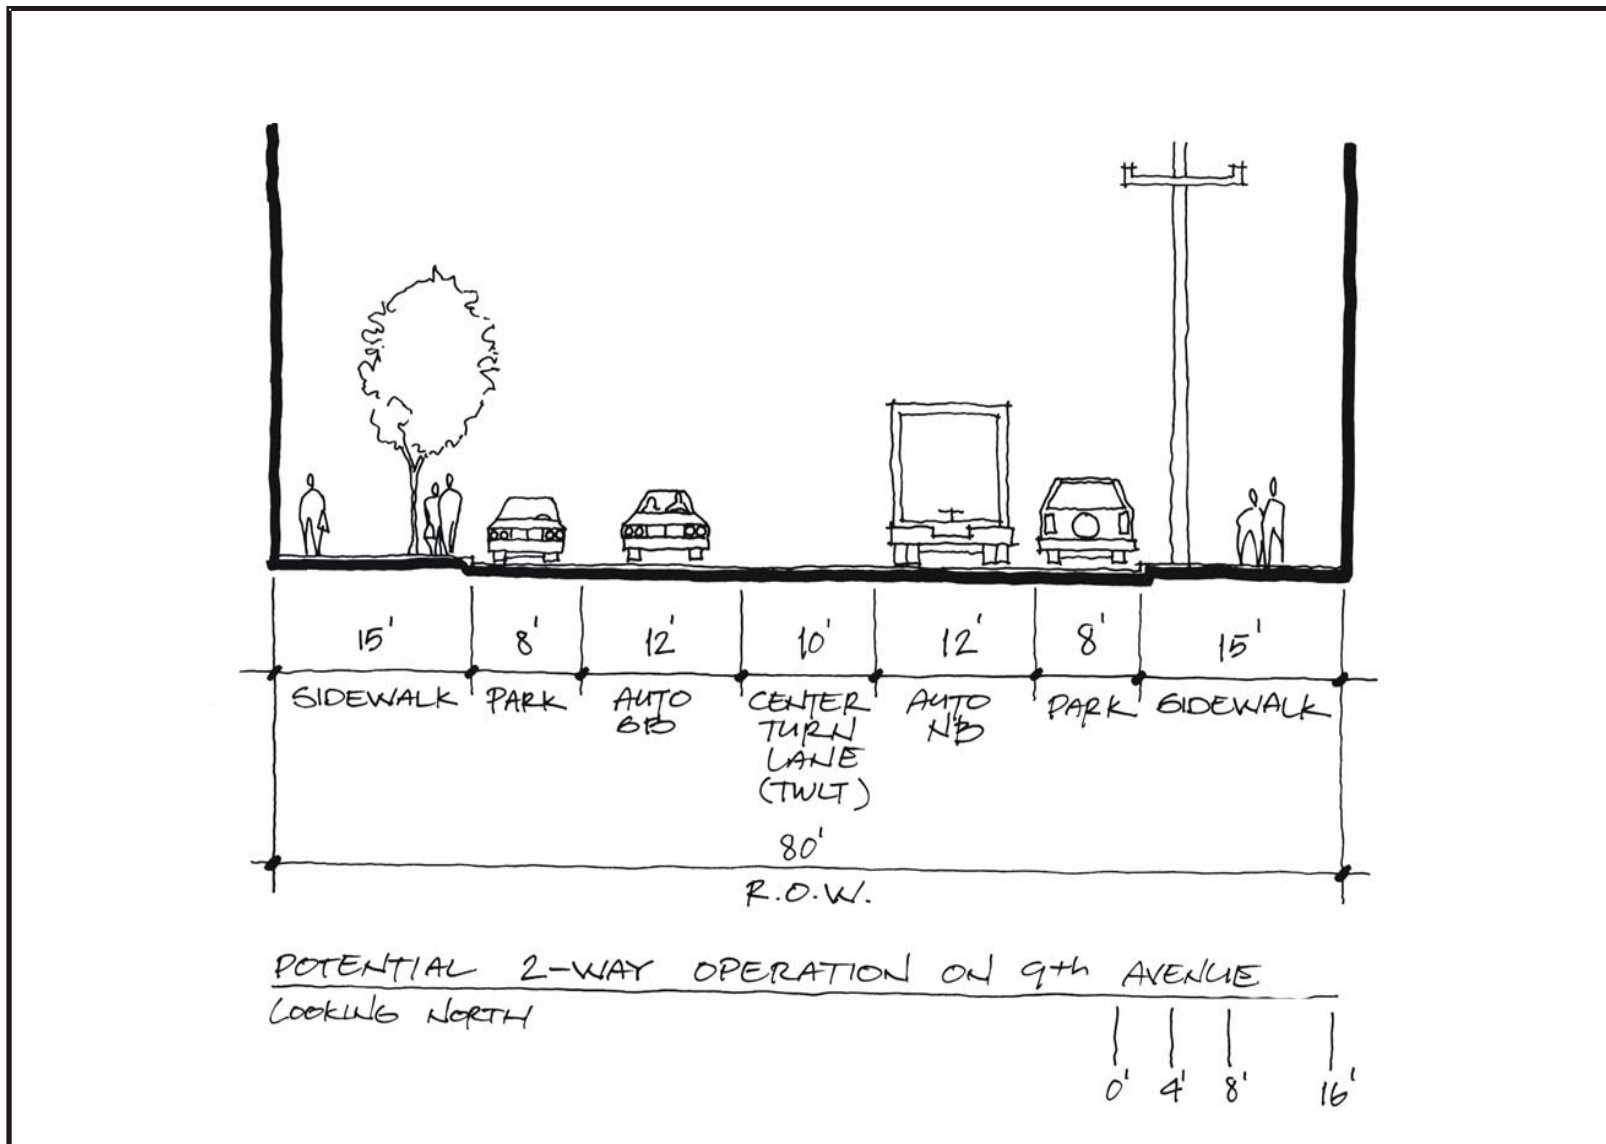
Proposed Two-Way Ninth Avenue Typical Cross-Section
